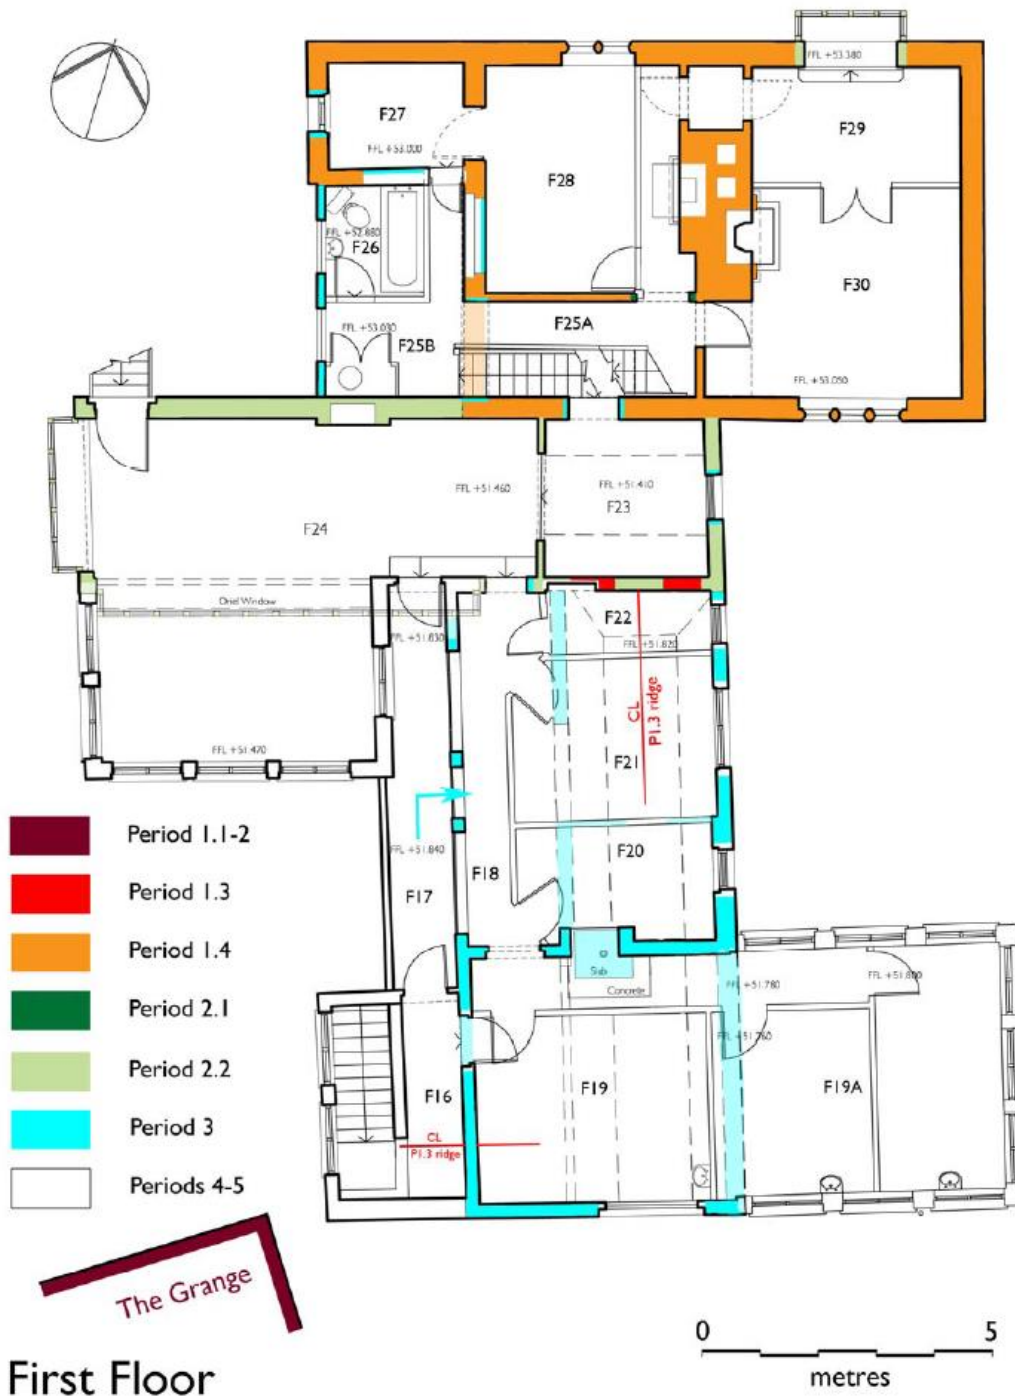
St Edward's: Phased first floor plan; demolished structure shown in lighter tone
